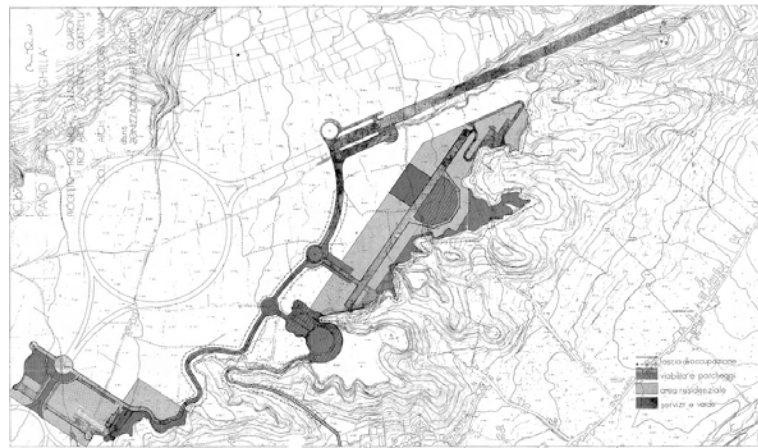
Arghillà Site Plan (Law no. 167/1972) – Site design for the area including residential estates, public facilities and roads (Source: City of Reggio Calabria, Dept. of Planning)
